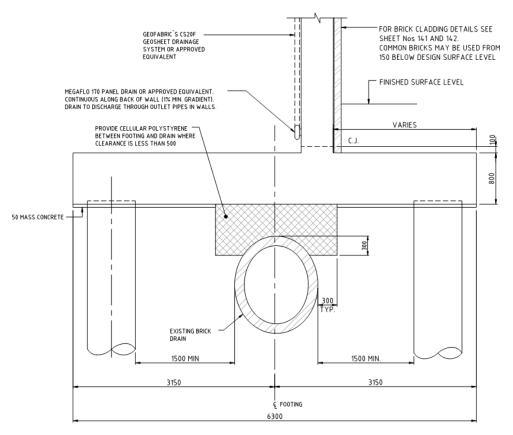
Section view of redesigned foundation for the Western Retaining Wall
